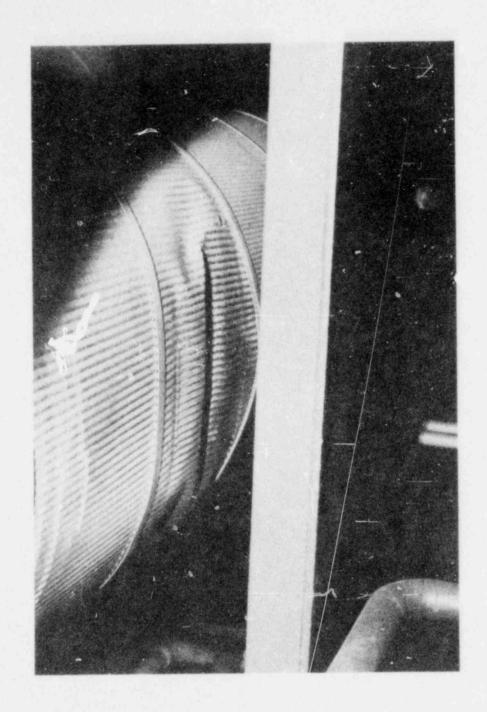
The Unit 4 main steam line moved about 1.5 in., hitting a structural member and denting insulation.
